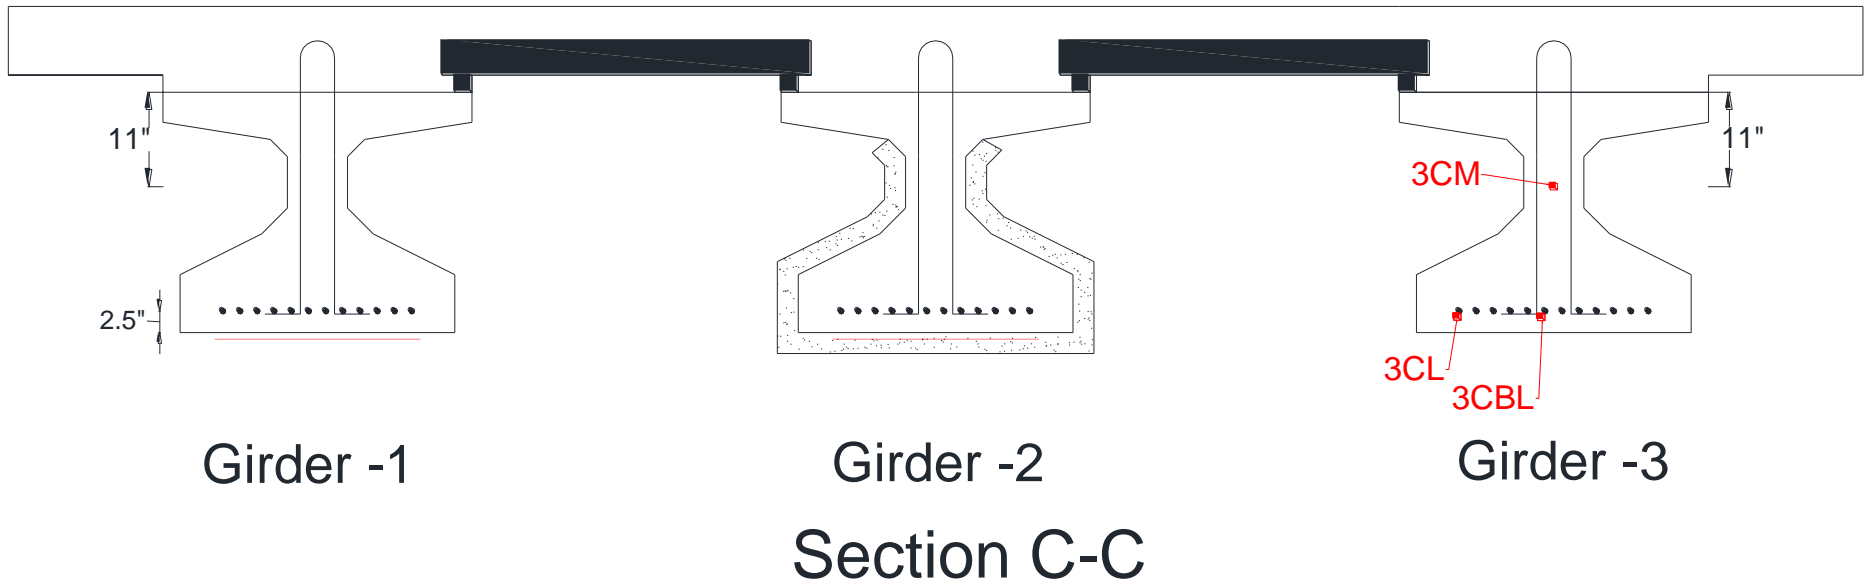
Locations and labeling of thermocouples on bearing pads and girders
